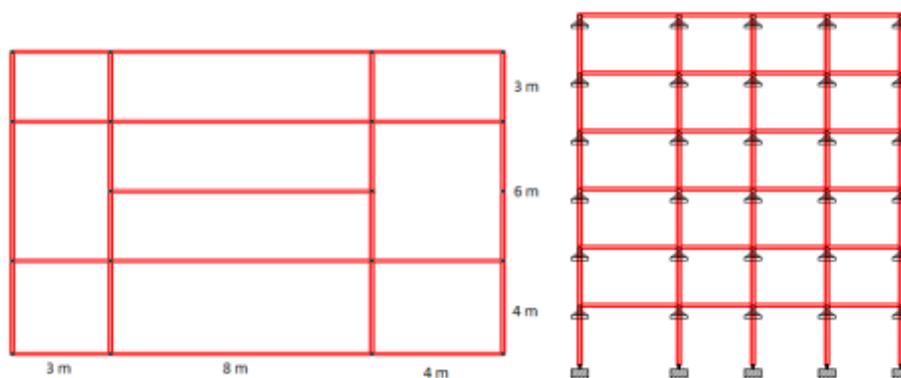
(a)Showing Staad building plan (b) side view of Staad model
